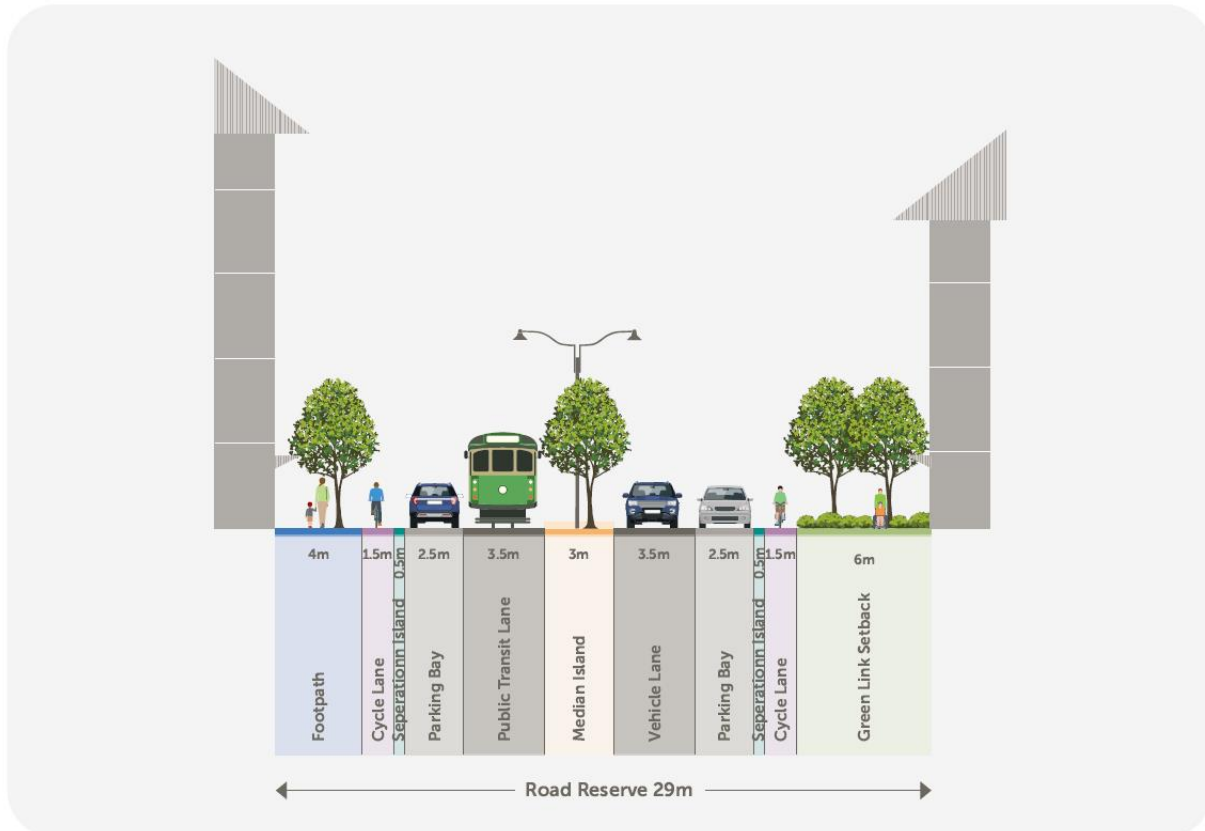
Indicative cross section - Pinjarra Road (29m Reserve)
